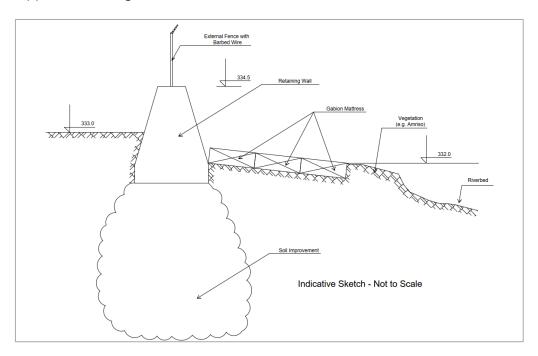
Flood retaining wall cross section (sketch not to scale) see Annex D5-26
